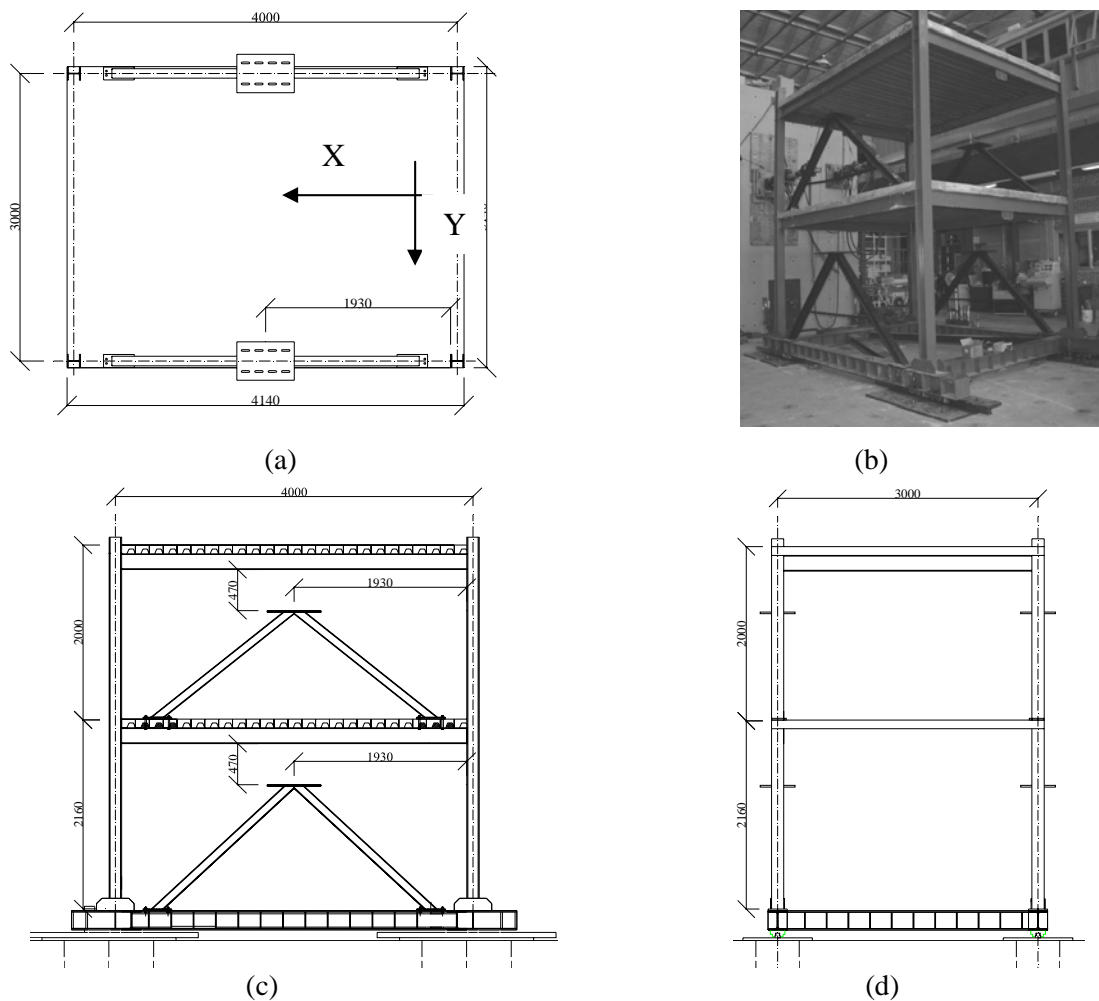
2:3 scaled steel frame built at the Structural Engineering Laboratory of the University of Basilicata in Potenza, Italy: a) Plan view; b) 3D view; c) Vertical plane XZ; d) Vertical plane YZ
